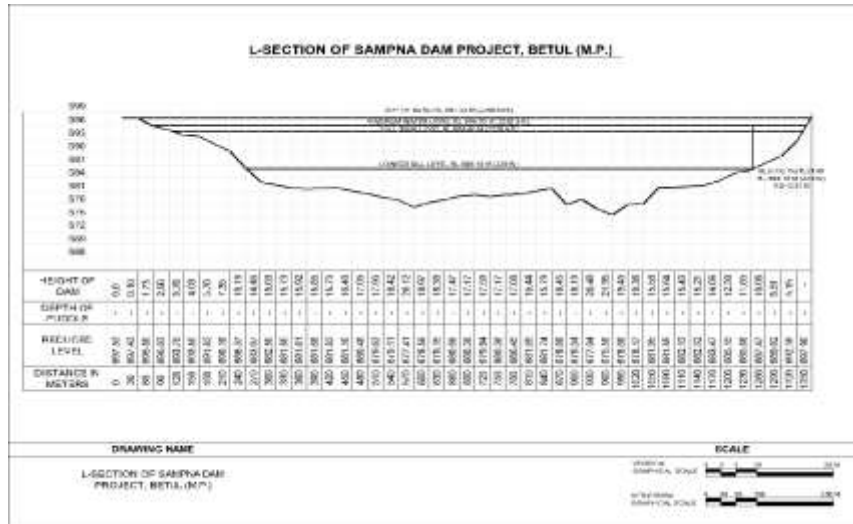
L-section of Sampna Dam (Source: NRLD, CWC)
